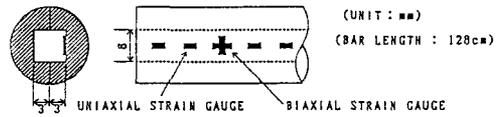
DETAILS OF GAUGE ARRANGEMENT
